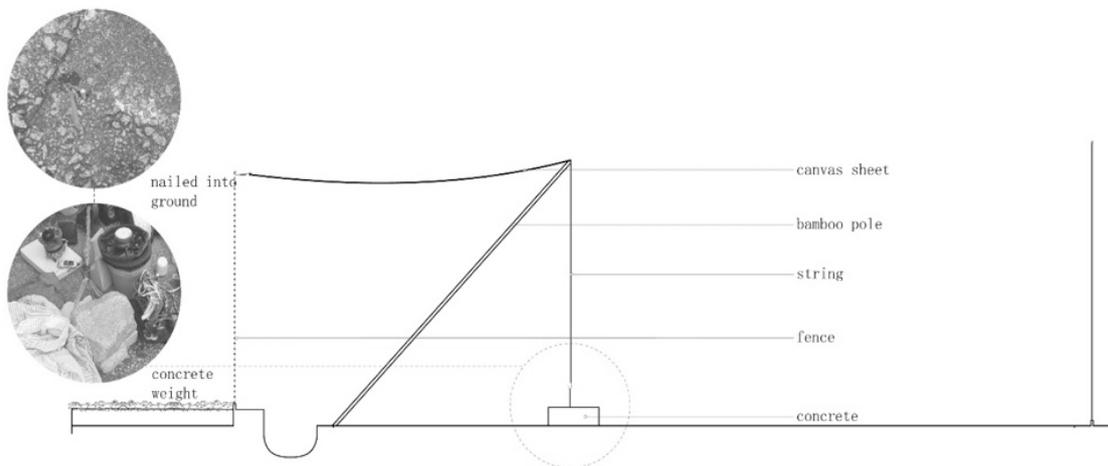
Section drawing – Shelter structure Type 2 (Illustration: Liaw Su Xin)
